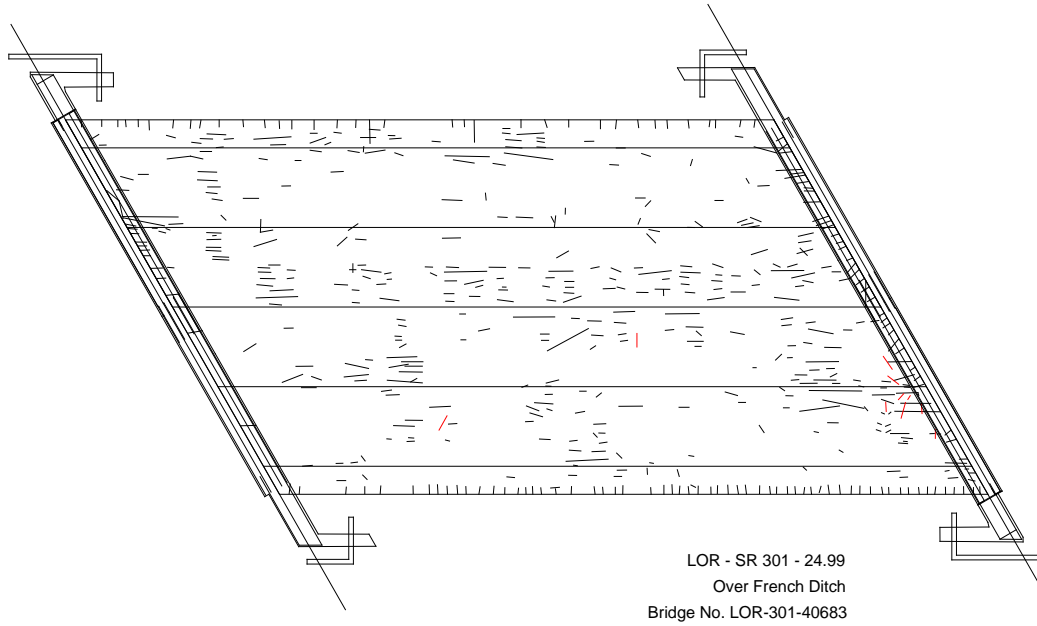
Crack map interposed with structural layout for Bridge Number LOR-301-40683
